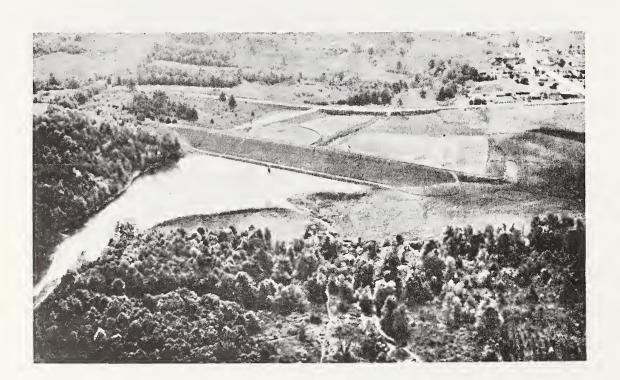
TYPICAL FLOODWATER RETARDING STRUCTURE
